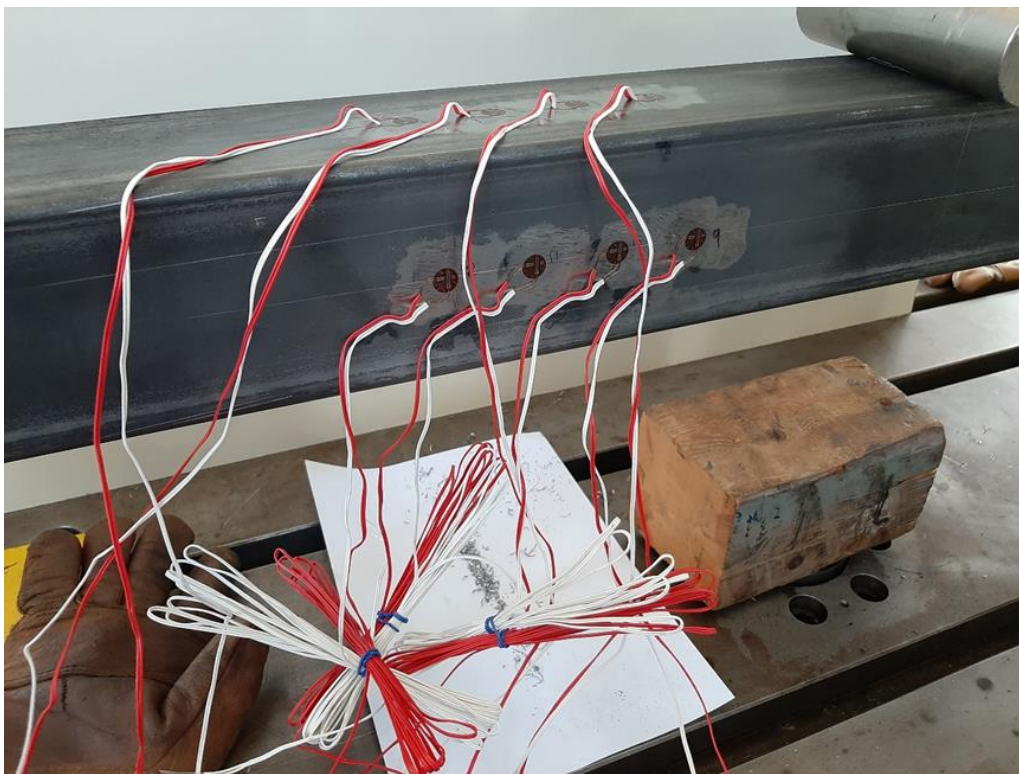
Strain Gage Placement on Actual Test Specimen
